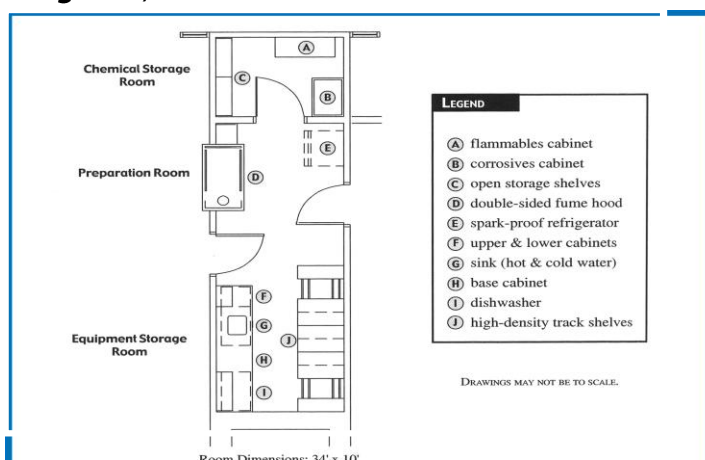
Prep / Storage Room Layout for Single Laboratory⁴
